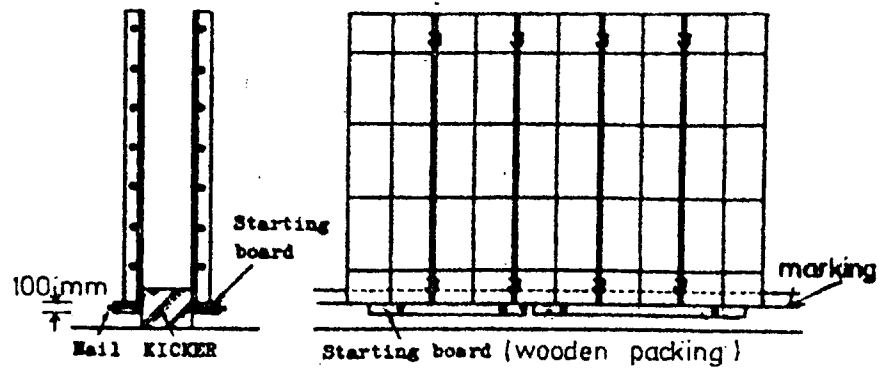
LEVELLING METHOD FOR INTERNAL WALLS, COLUMNS & STIFFENERS AND INNER FACES OF PERIPHERAL WALLS & COLUMNS
